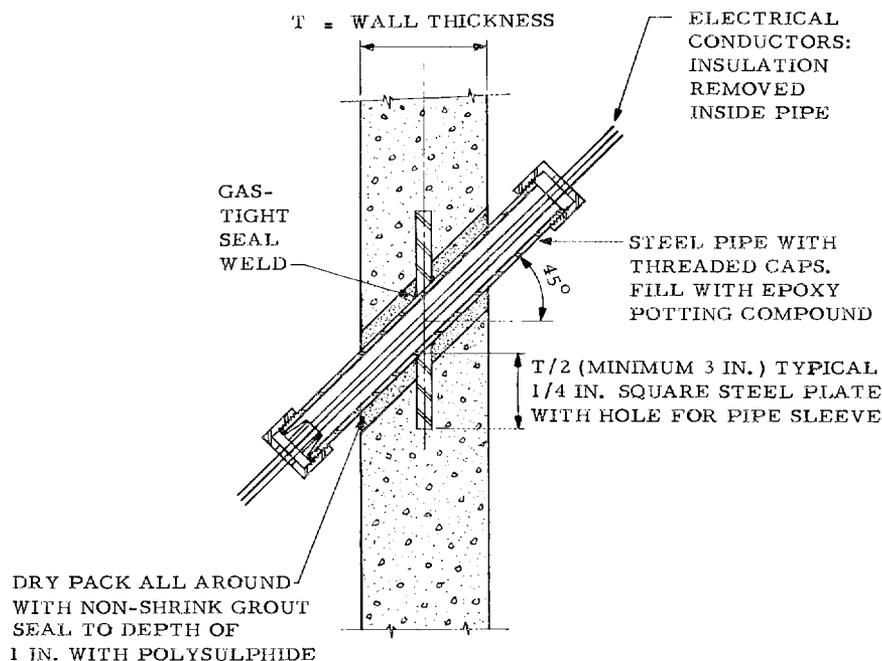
Electrical Penetration Through Concrete Wall. (From ref. 2)
